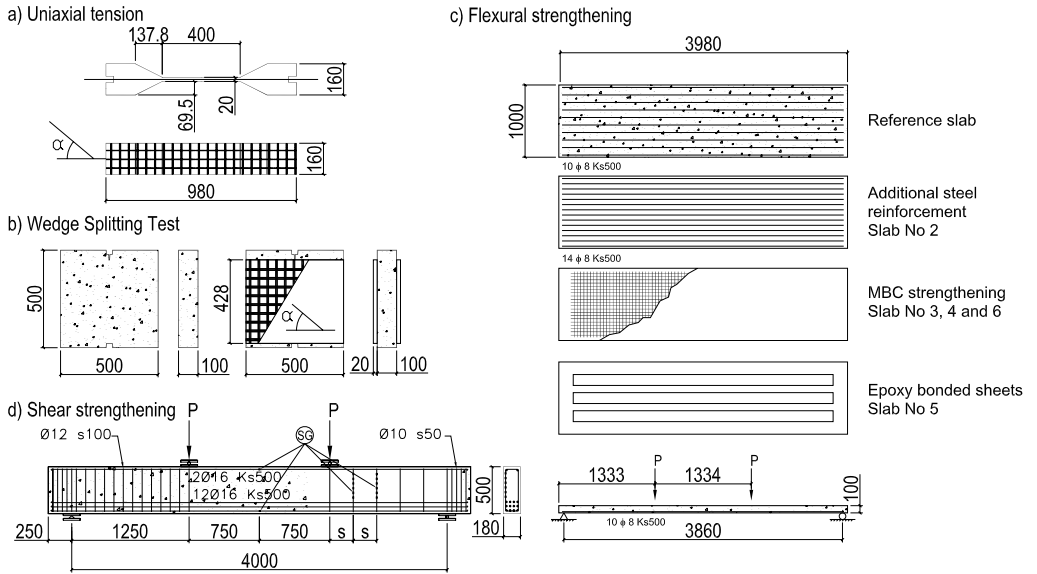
Experimental tests for tensile and fracture behaviour: (a) uniaxial tensile test on dogbones, (b) wedge-splitting test, (c) flexural beams and (d) shear beams
